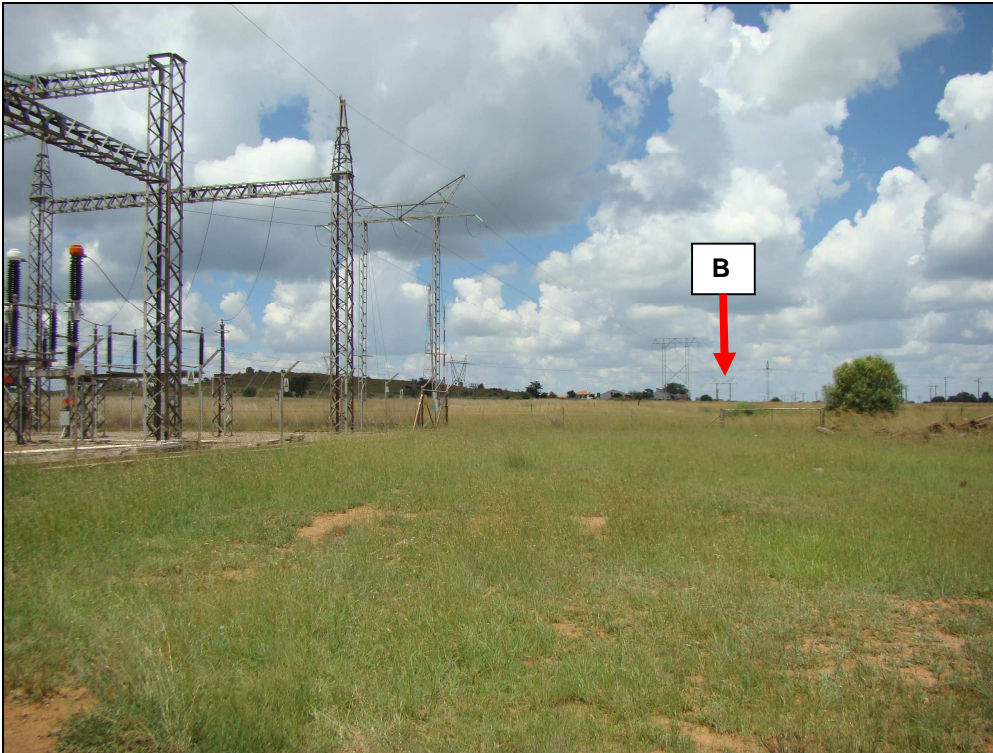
Point A at Brakspruit Eskom Sub-station near Klerksdorp, facing Point B.
